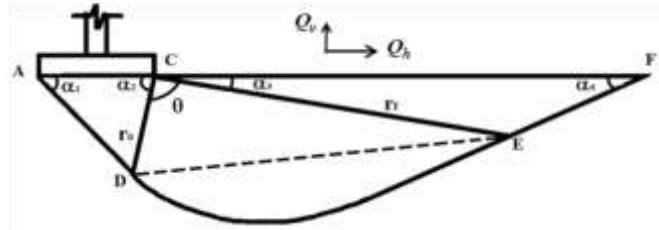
One-sided failure mechanism showing composite failure surface under surface strip footing AC of width B
